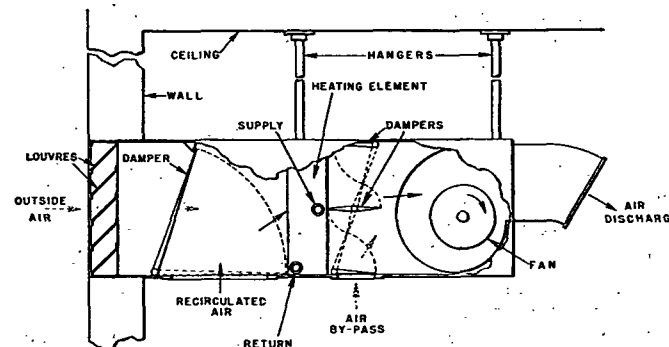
SUSPENDED TYPE UNIT HEATER, HOUSED TYPE FAN
